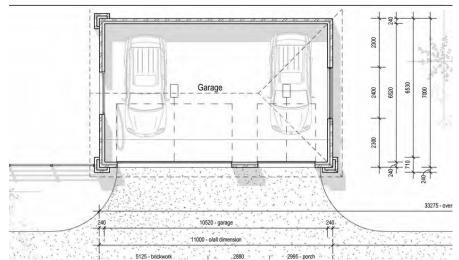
Detached Garage (source: BB Design and Documentation, Proposed Floor Plan).
